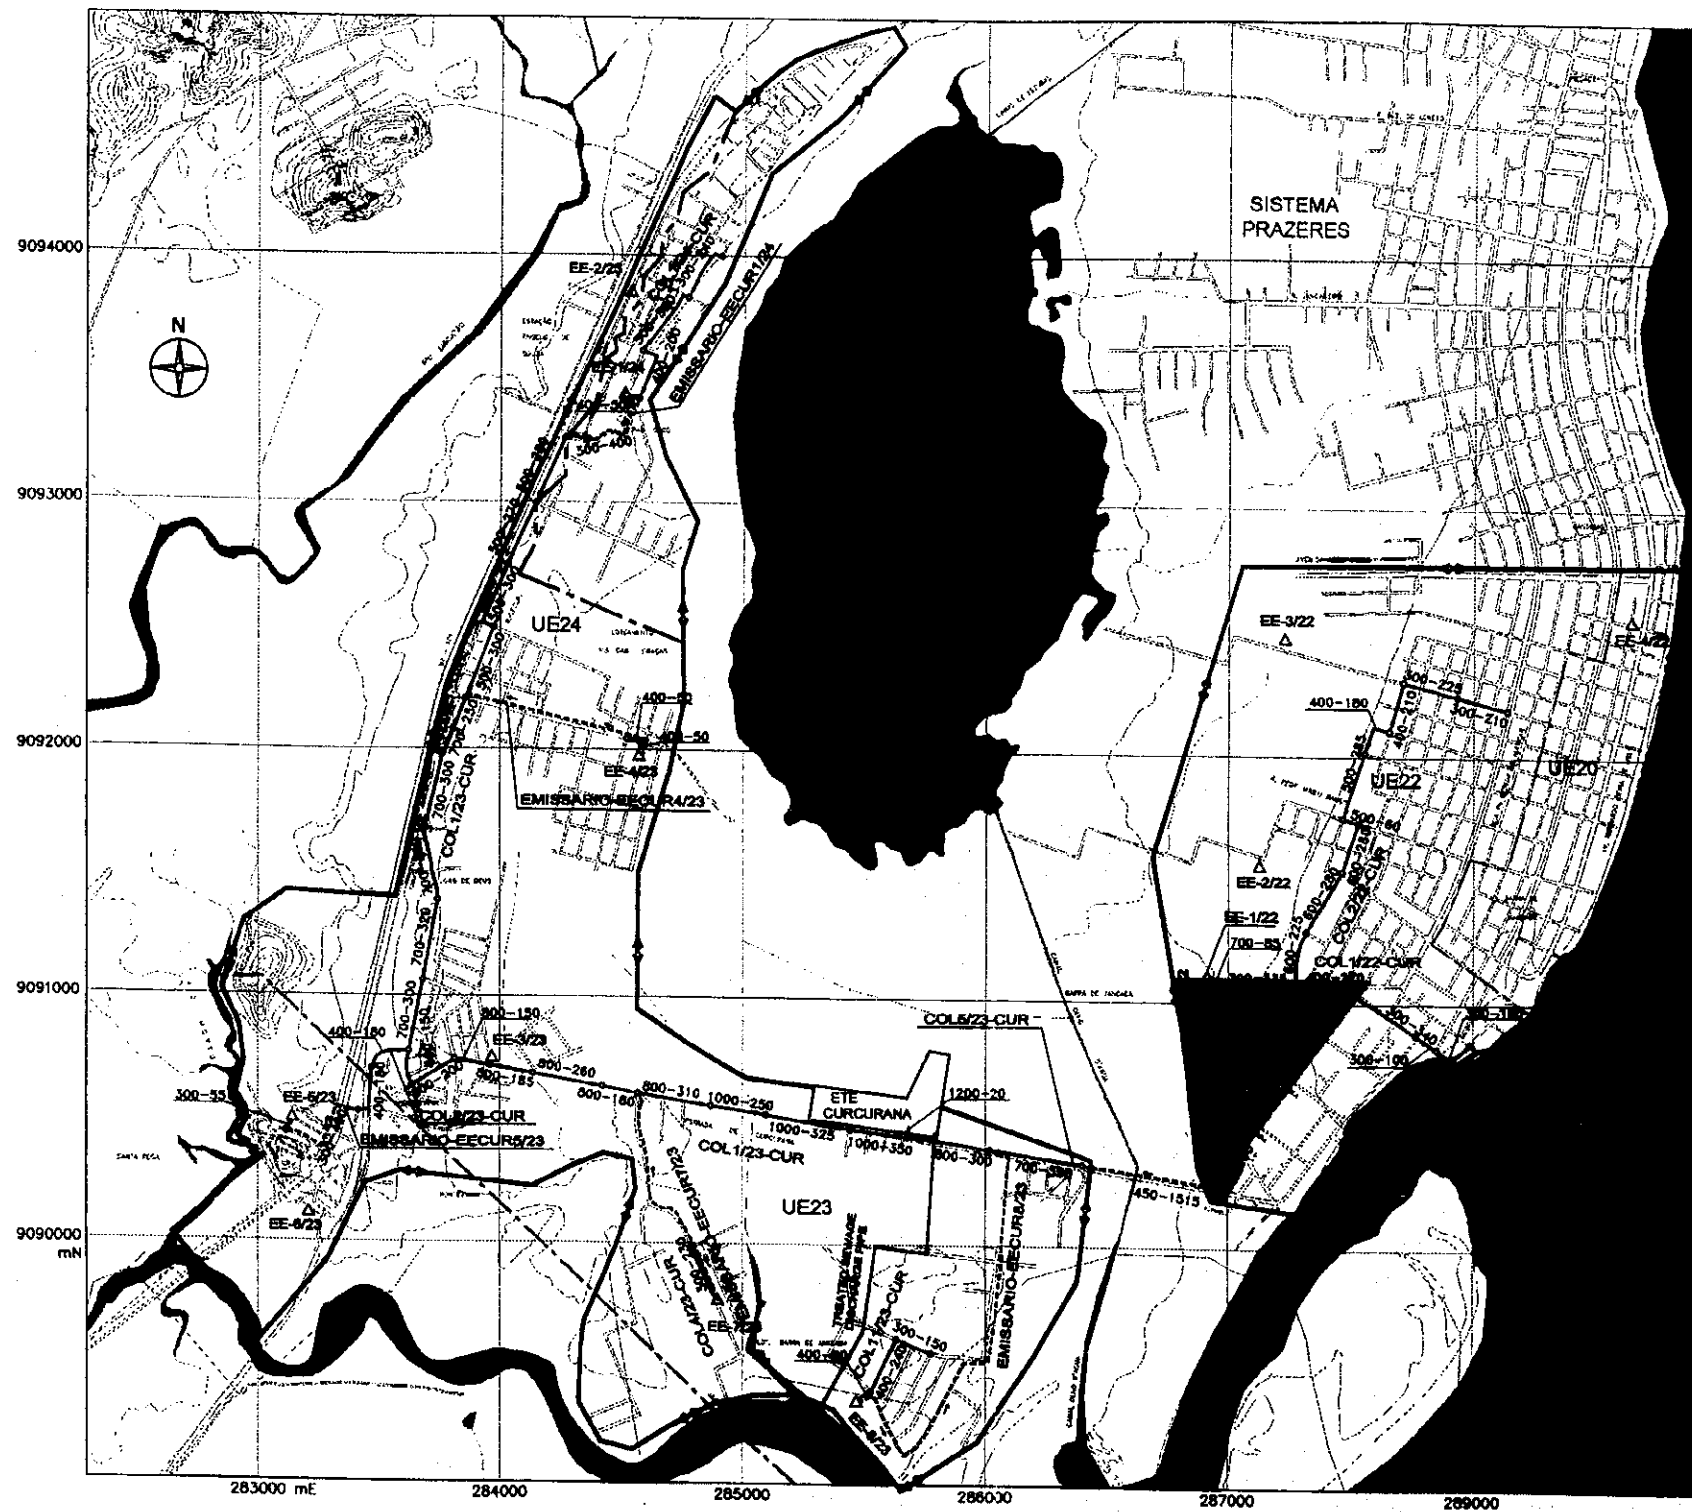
Layout Plan of Prazeres System
